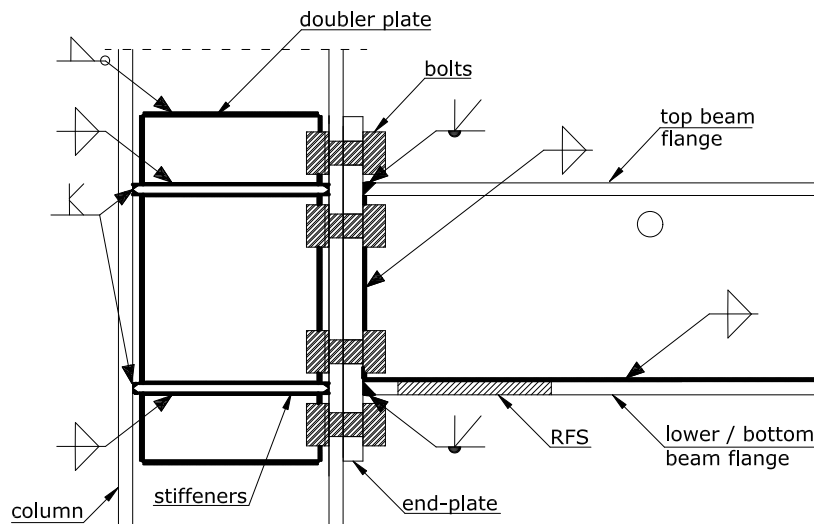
Detailing of the welds for the SF beam-to-column joint
